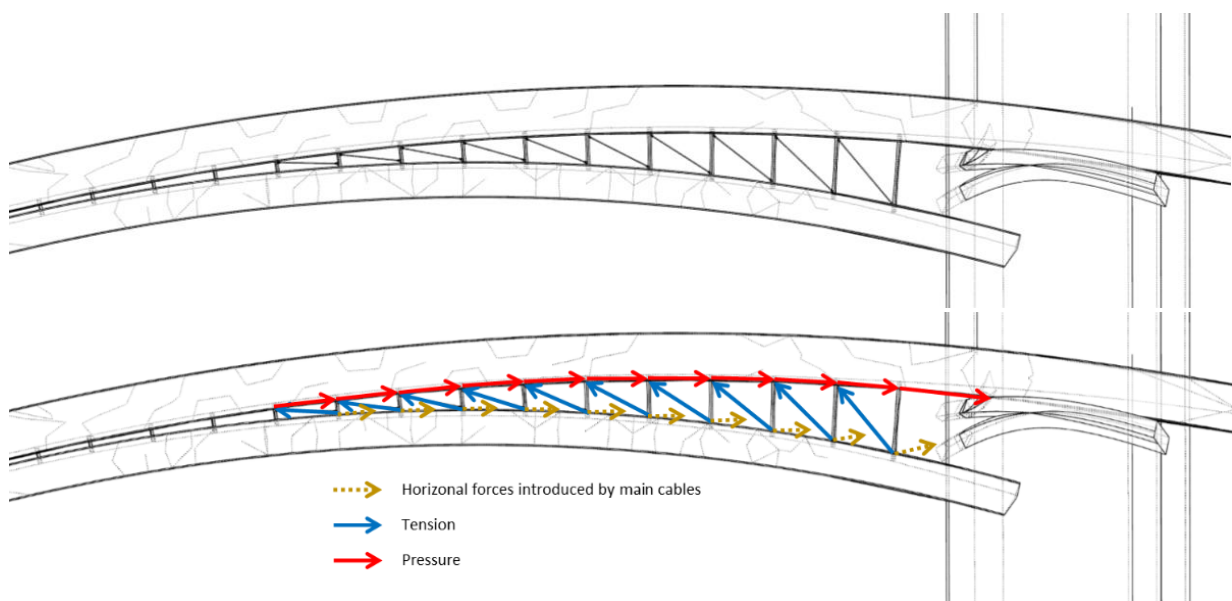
Configuration of beams and cross cables between the bridge decks (top) and a diagram showing how forces are diverted from the pedestrian deck to the cycling deck (bottom)
